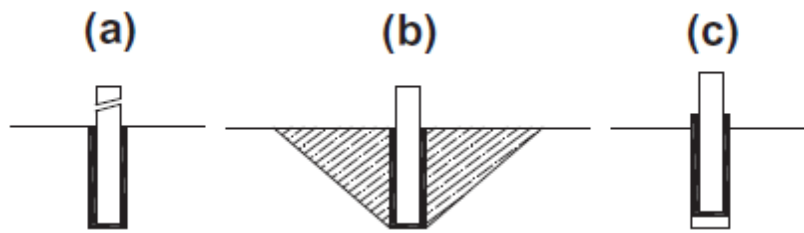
Separated failure modes used in design methods: (a) tensile failure of the steel anchor bolt, (b) full concrete failure, and (c) bond failure: extraction of the steel bolt from the concrete [11].
